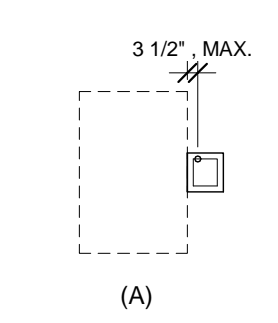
TOP HANDRAIL EXTENSION AT STAIRS
